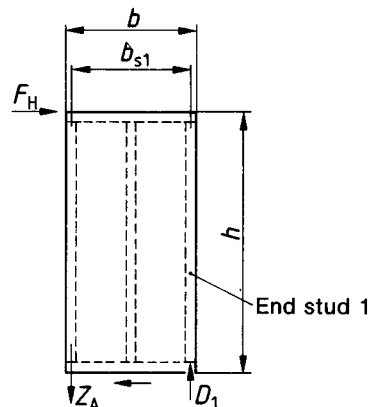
Tensile anchor force, Z_A , and compressive force, D_1 , in lower horizontal member
